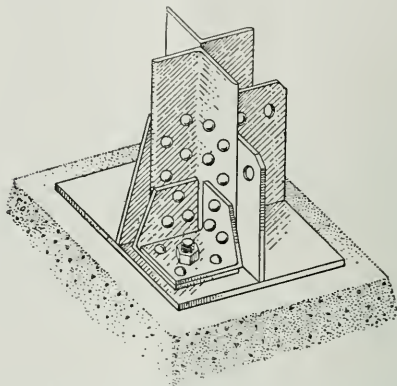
Typical Construction of Footing for Angle Iron Column.
